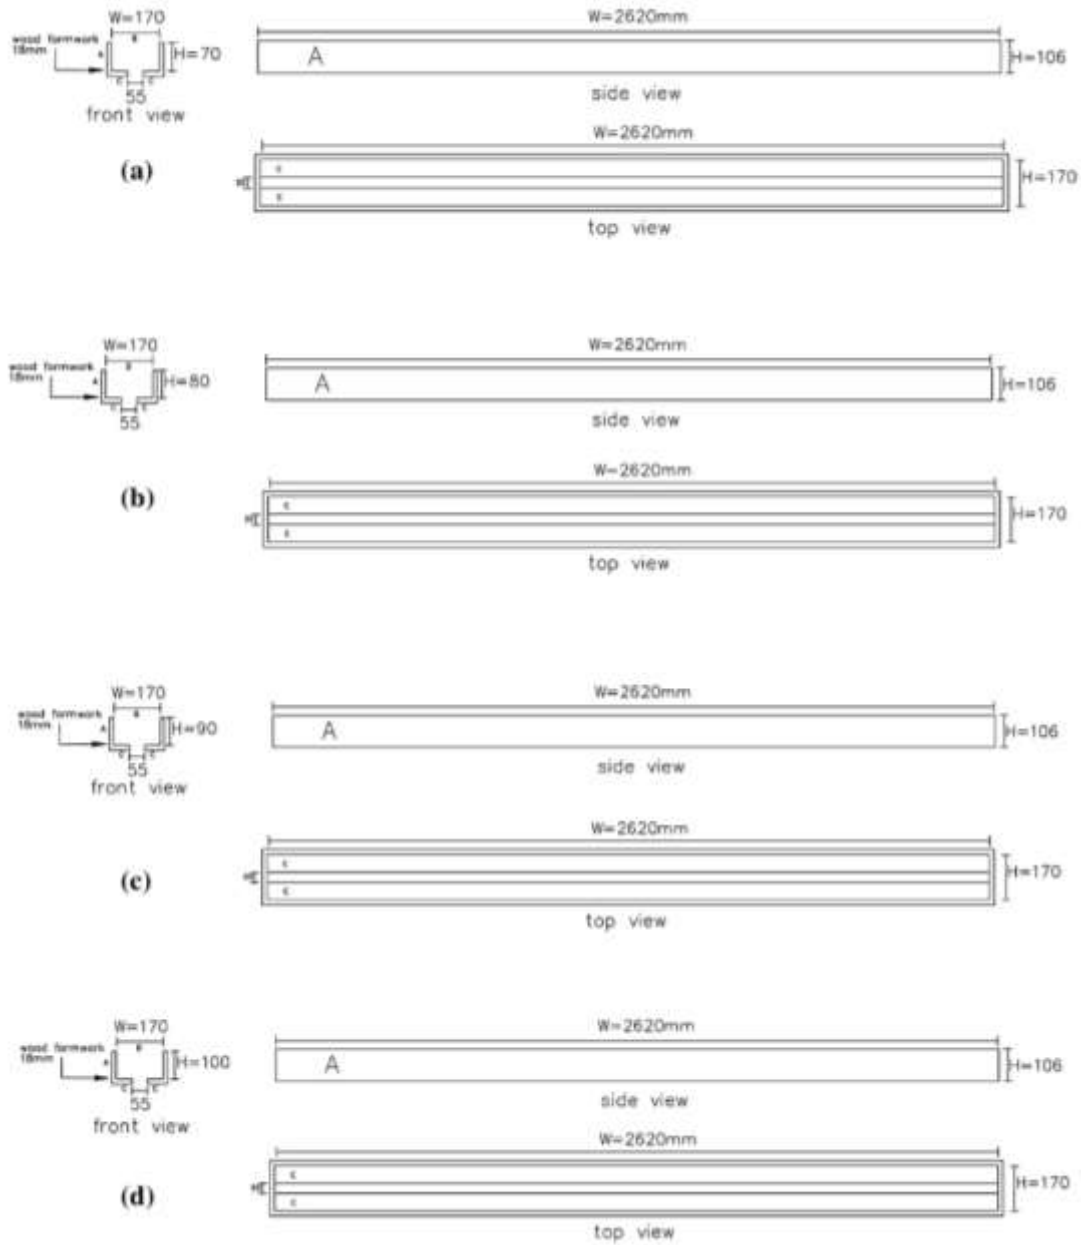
Main Eight Specimens' Bottom Wooden Molds Drawing Sheets and Dimensions. (a) Bottom Molds for DCTG-1, (b) Bottom Molds for DCTG-2, (c) for the Bottom Molds of DCTG-3, (d) Bottom Molds for DCTG-4
